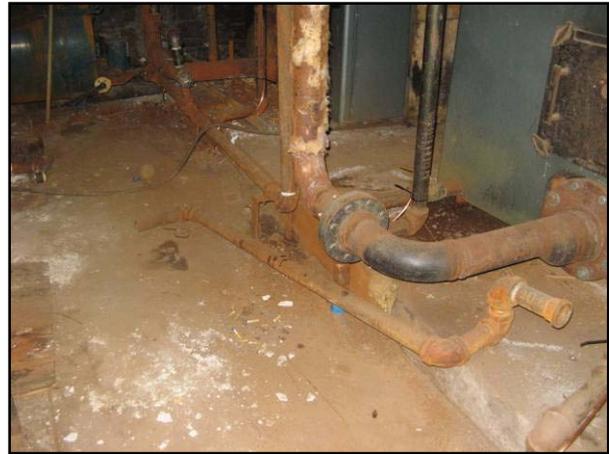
Sample of Corroded Piping in Basement Mechanical Room (Note replacement piping)
